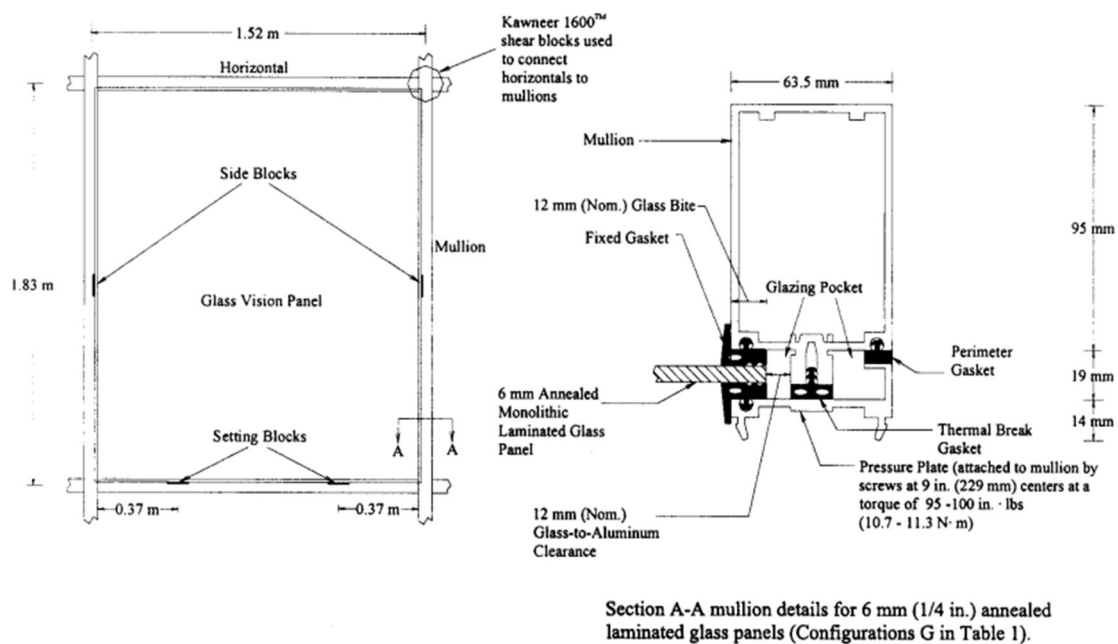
Glazing details for the mid-rise aluminium curtain wall-framing system⁷
